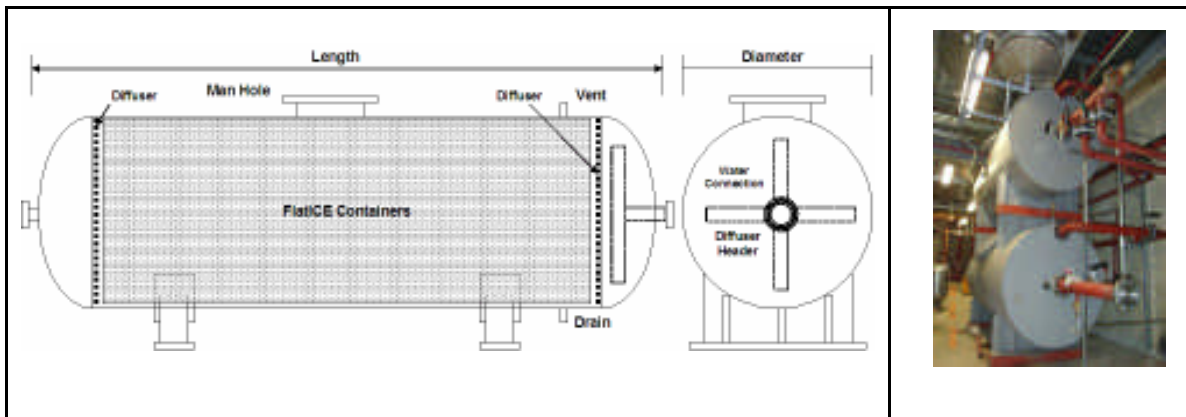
Typical Cylindrical FlatICE plastic containers TES Tank Design
